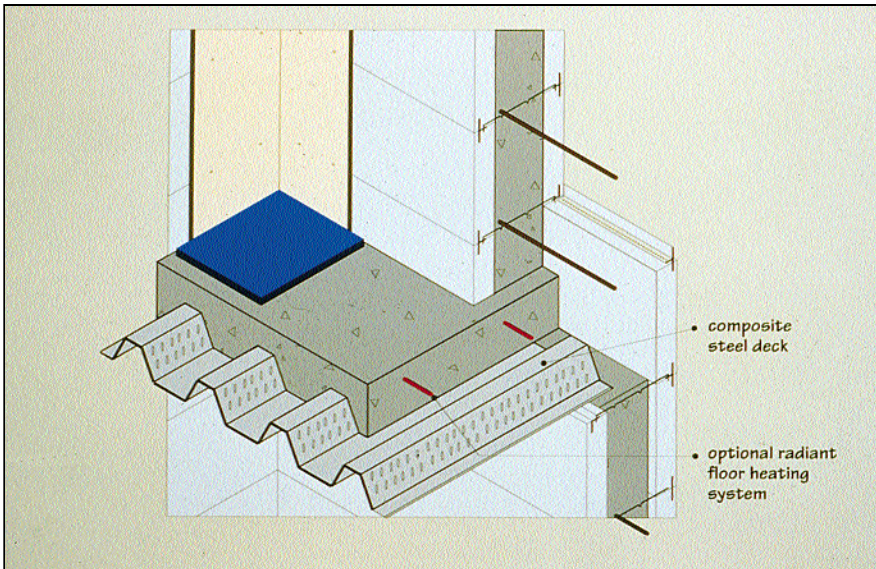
Cutaway view of a concrete-on-steel-deck floor.
